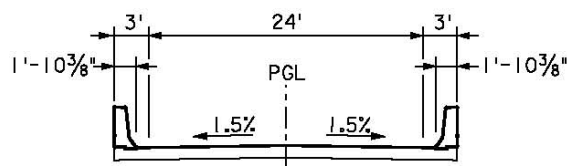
A - 43 U-TURN TYPICAL SECTIONS
